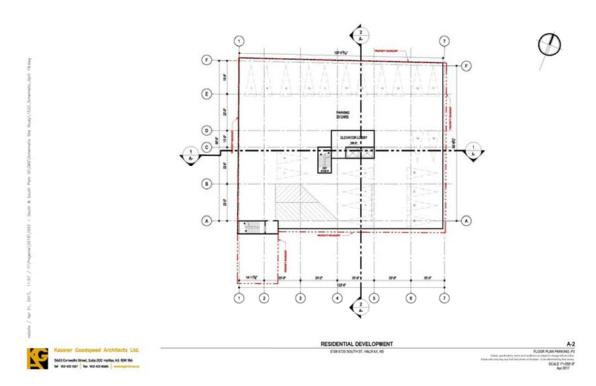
5706-5720 South Street Parking P1 and P2 Floor Plan
